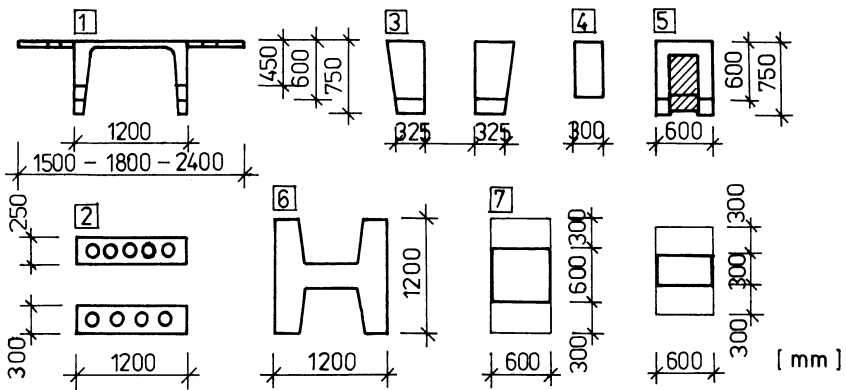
Basic cross section of the precast elements (1) ribbed slabs; (2) flat slabs; (3) and (4) twin beams; (5) contour beams; (6) H-section column; (7) columns of rectangular cross section
